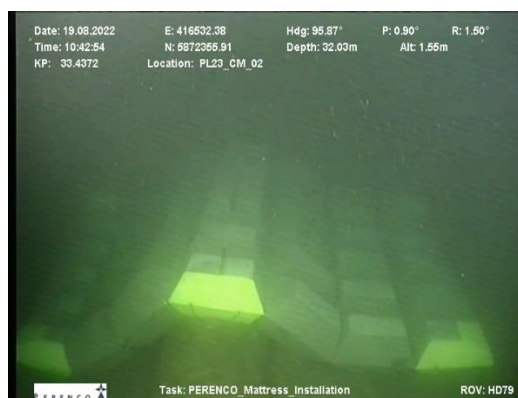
Examples of concrete mattresses used to remediate exposed pipe
